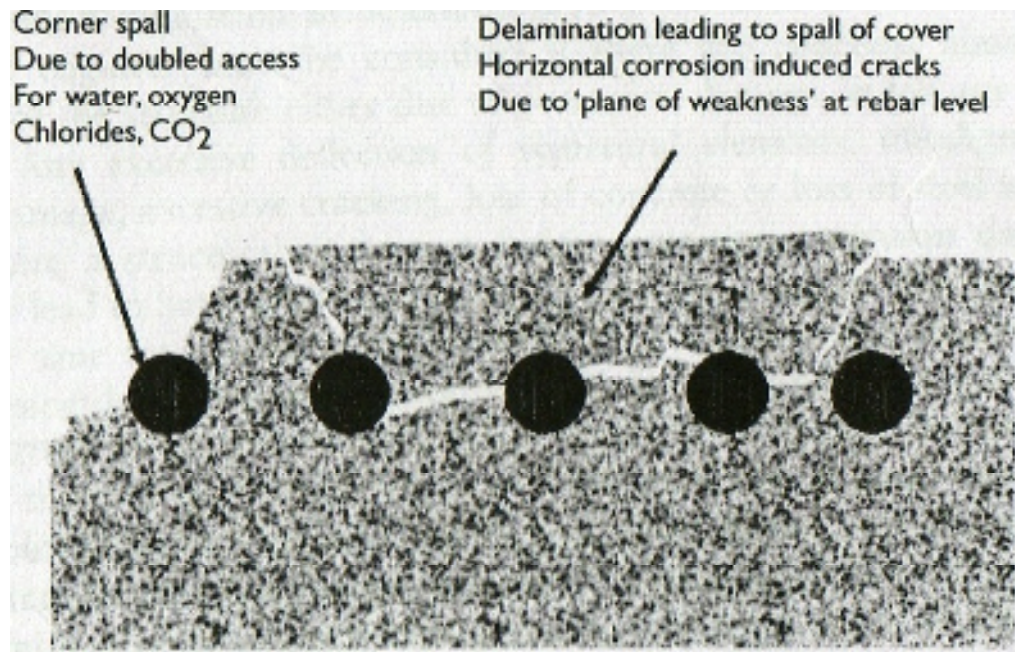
Schematic of corrosion induced spalling at corners and delamination at the plane of the reinforcement [Broomfield et al. (2002)]
